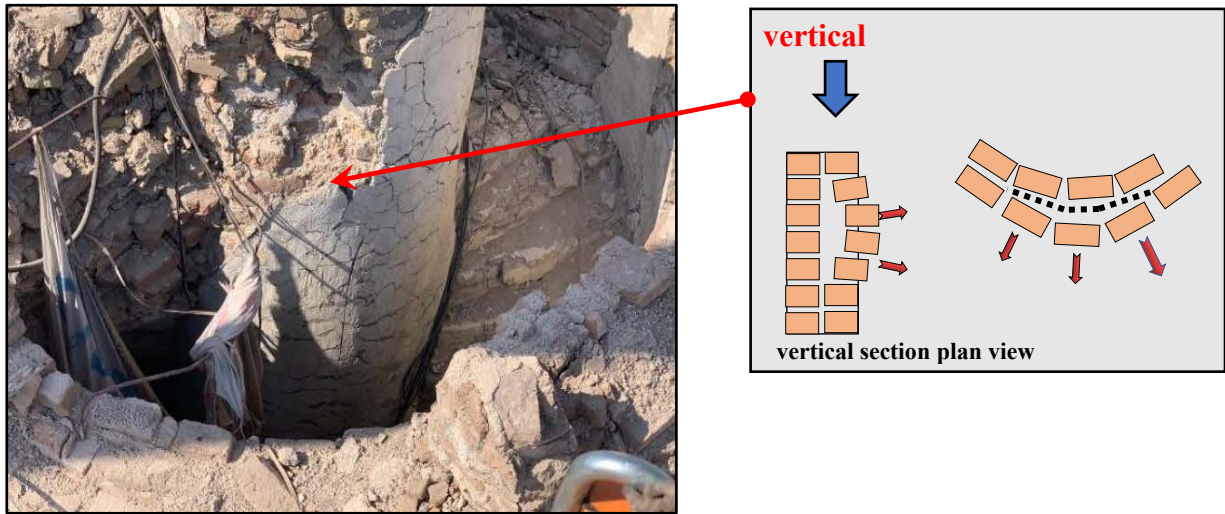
Detail: residual shaft of the Minaret (De Vito 2019) (left). Trunk masonry under vertical load Damage model (right).
